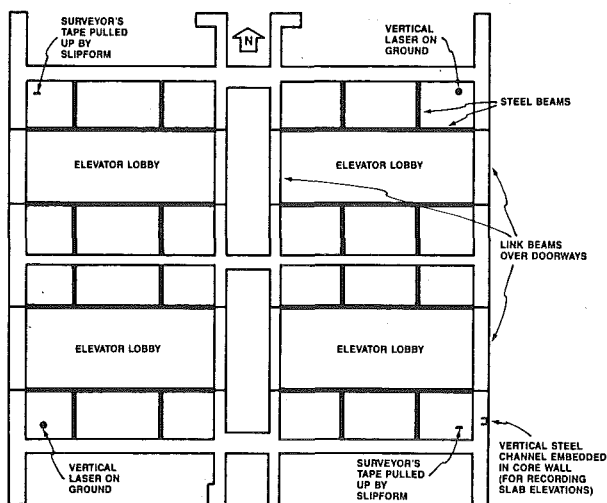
Four Shafts of Building Core (Courtesy of Concrete Construction)
